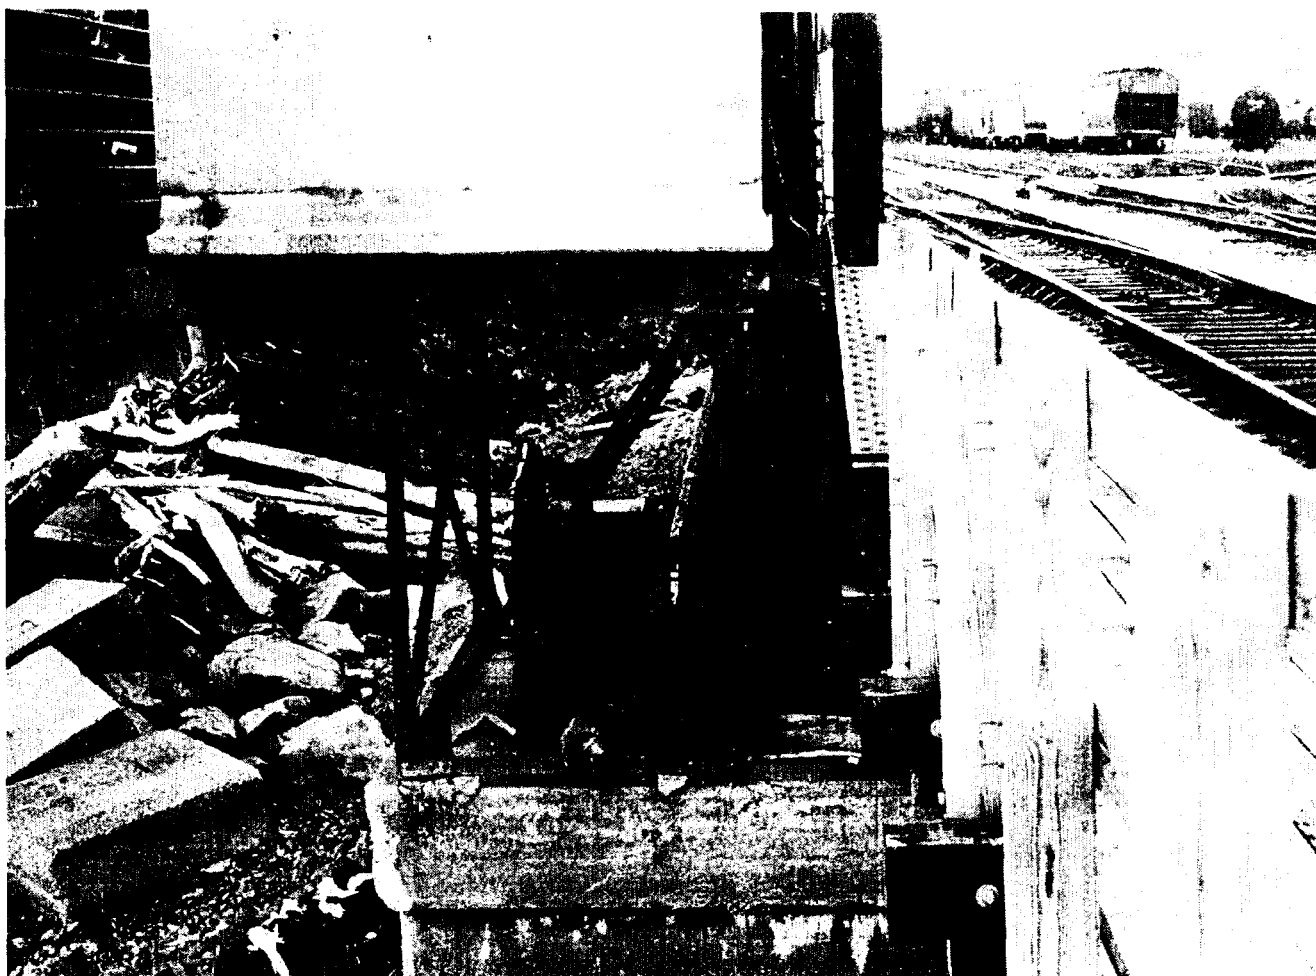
Bridge operating machinery raised on concrete platform beneath operator's house. Note recently installed bridge railing at right. View to north.
